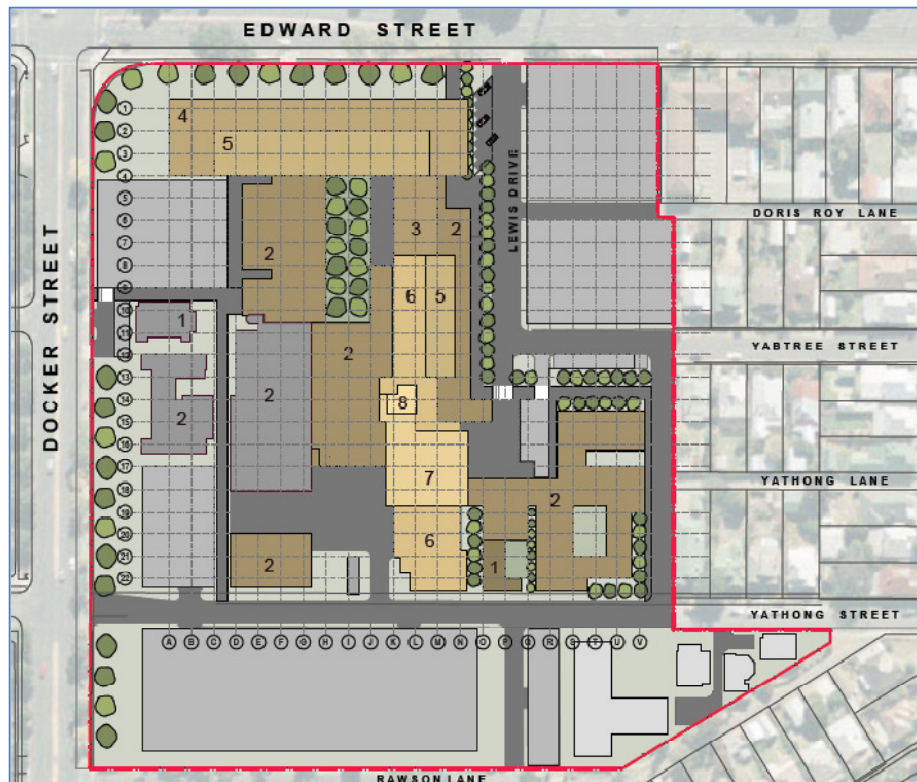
Plan view of Site -- Helipad shown as Level 7 (Level 8 is lift motor room)
